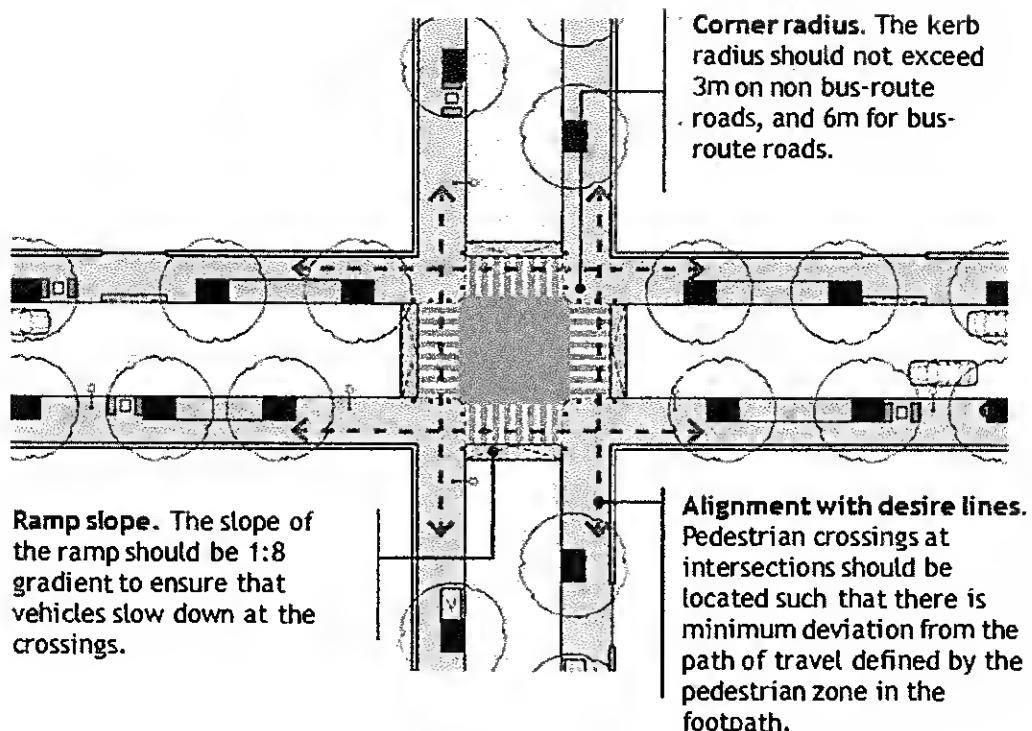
Raised Pedestrian Crossing at Intersection
